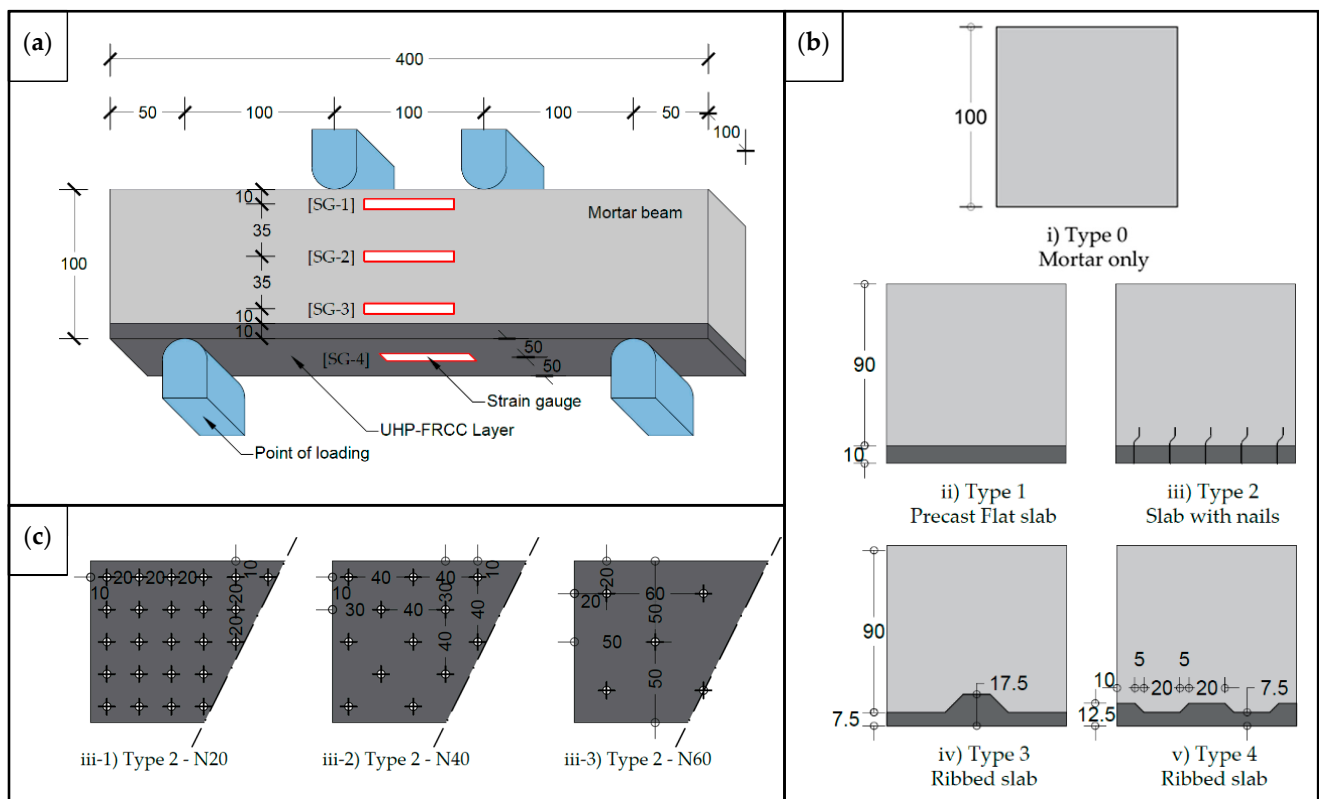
Mortar beams retrofitted by precast UHP-FRCC layer in Test Campaign 1. (a) Specimens shape, strain gauges arrangement, and test configuration. (b) Types of precast layer; (c) Neil density on the surface of the Type 2 precast layer for improving the connection with the mortar beam.
